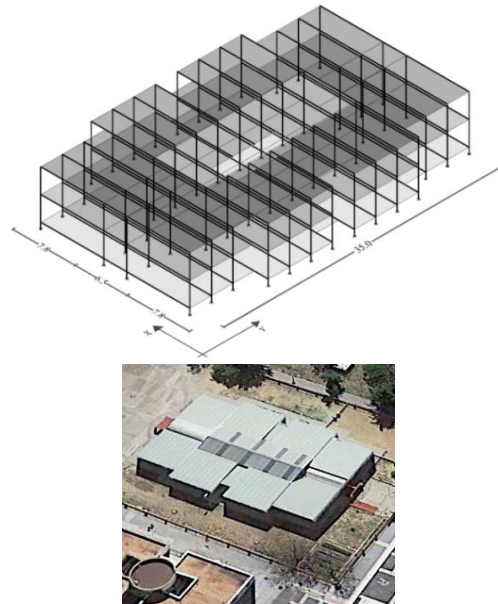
Building type A (O-shape): RC frames structural system (dimensions in meters).
